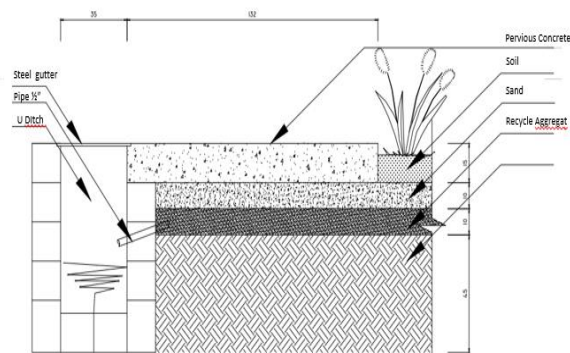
Cross section of pervious concrete for pedestrian walkways.
